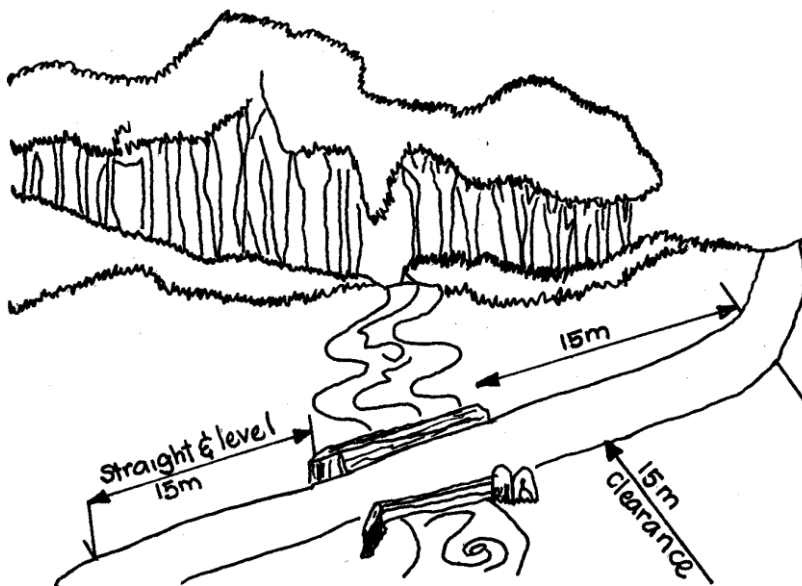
Roads should be located to avoid steep side cuts and approach stream crossings at right angles where possible.
